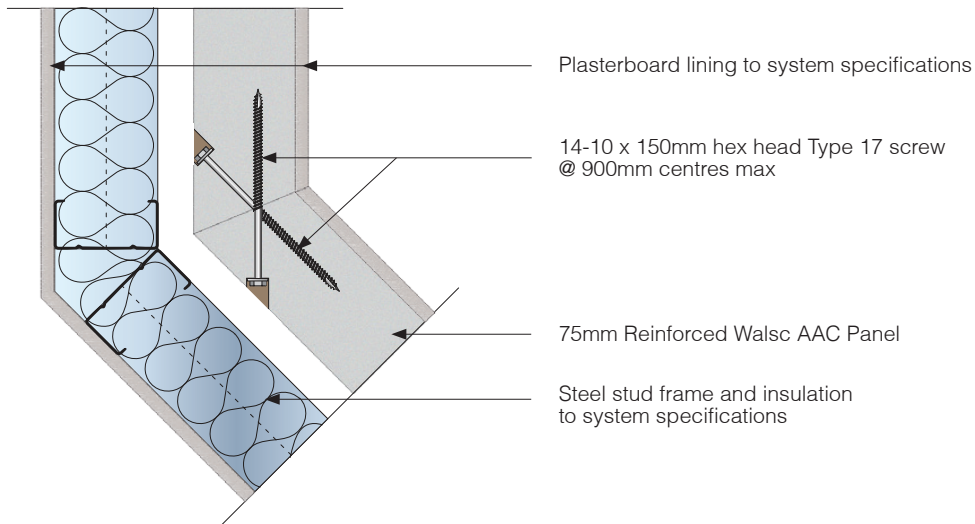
Internal Cavity Wall System Mitred Fixed Joint Detail
